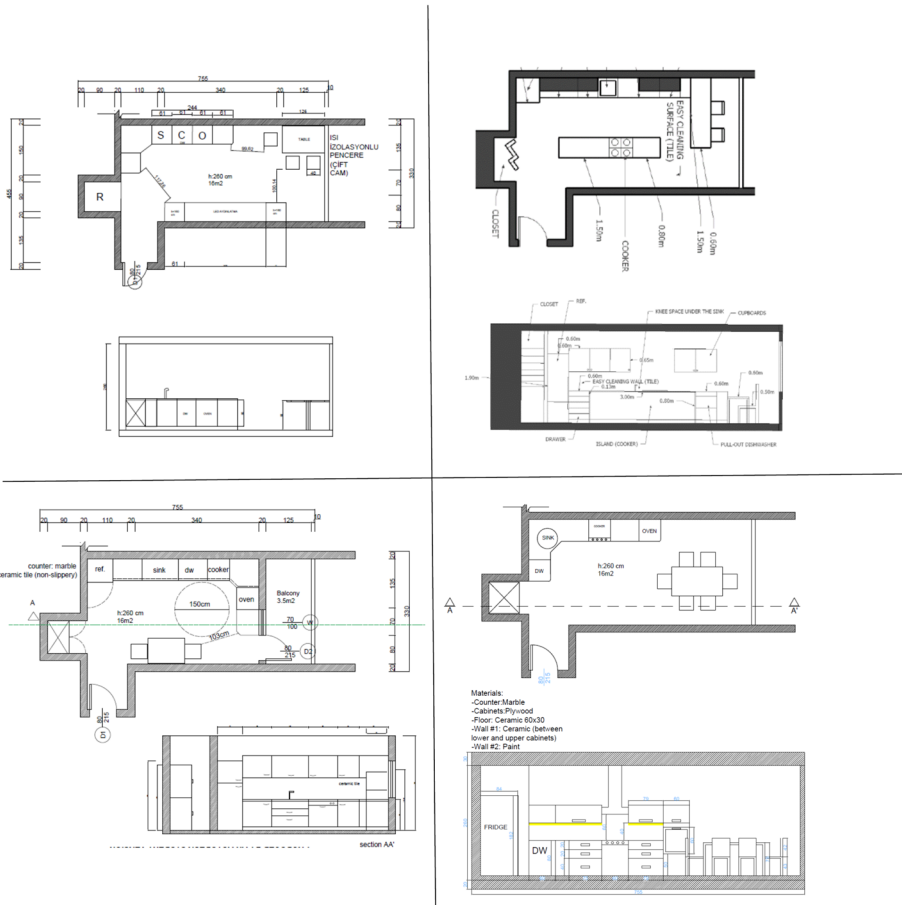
Floor plan and section drawings (Group A, B, C and D, left to right)
